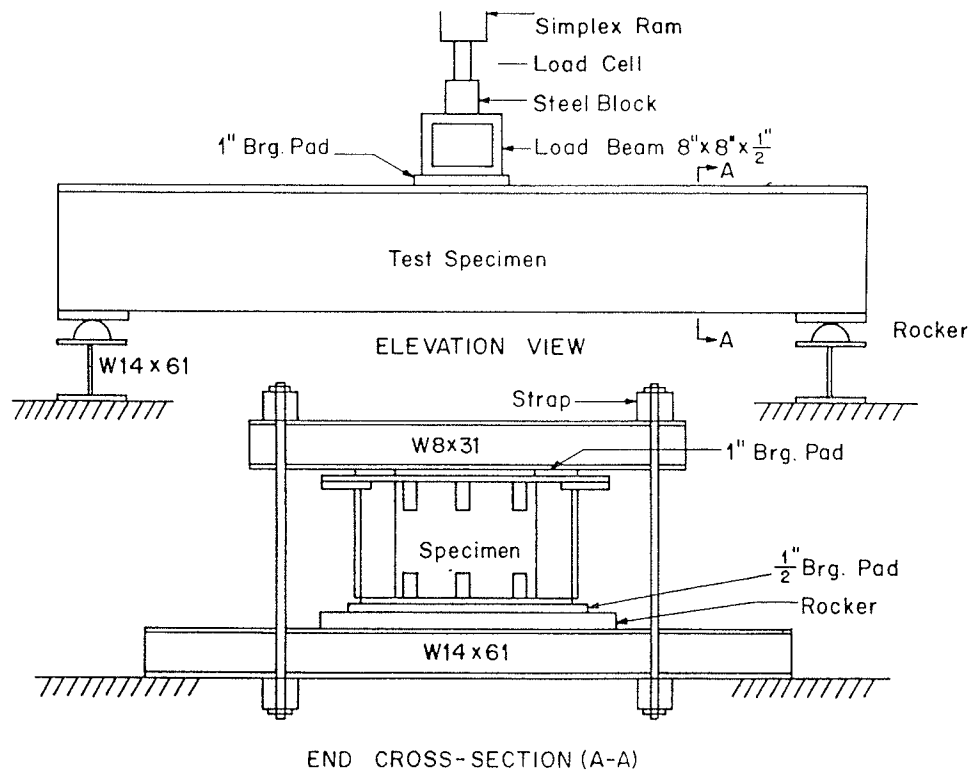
Schematic loading arrangement for specimens B7 and B8 (64).
